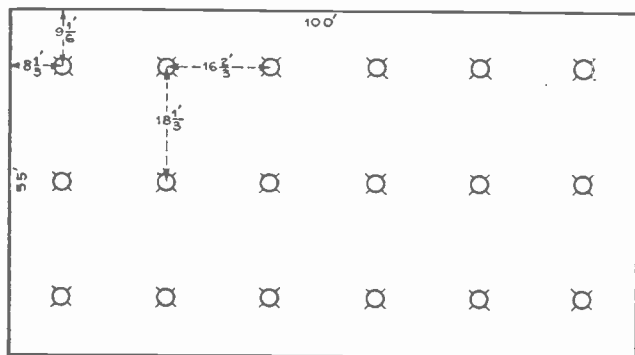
This sketch shows the arrangement and spacing of lights for a practical factory lighting job.
